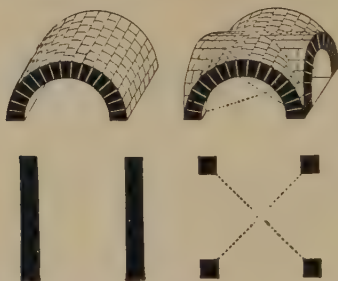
Barrel or tunnel vault and cross or groined vault formed by the intersection of two tunnels. The lines of intersection are known as groins. Cf. Fig. 5.
